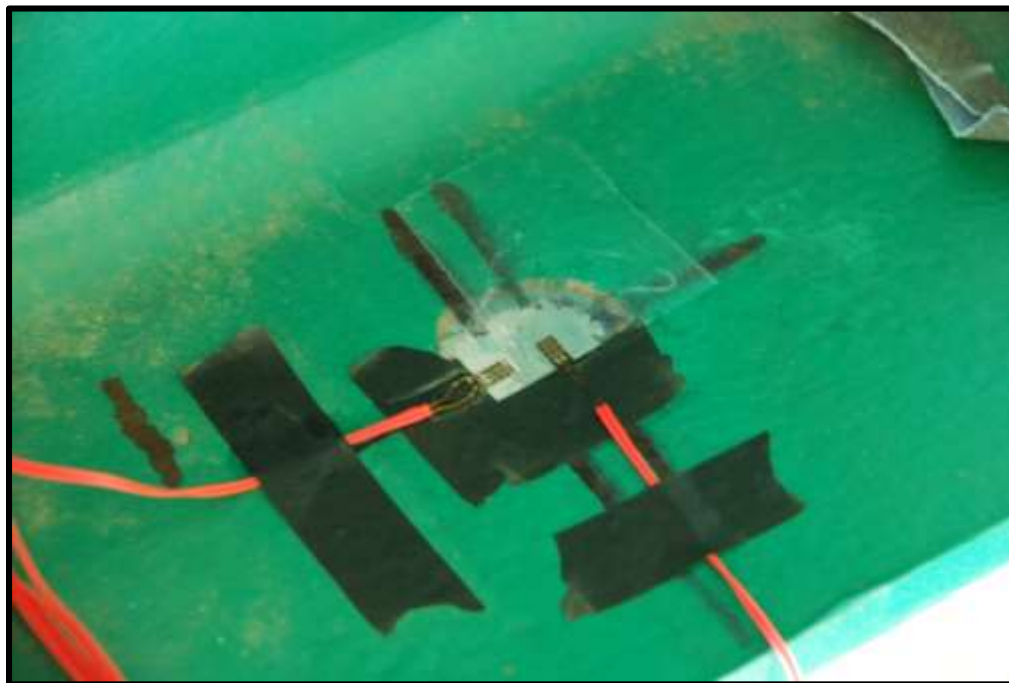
Photograph of Full Bridge Strain Gauge Installed on the Bottom Flange of Beam E, North Face
